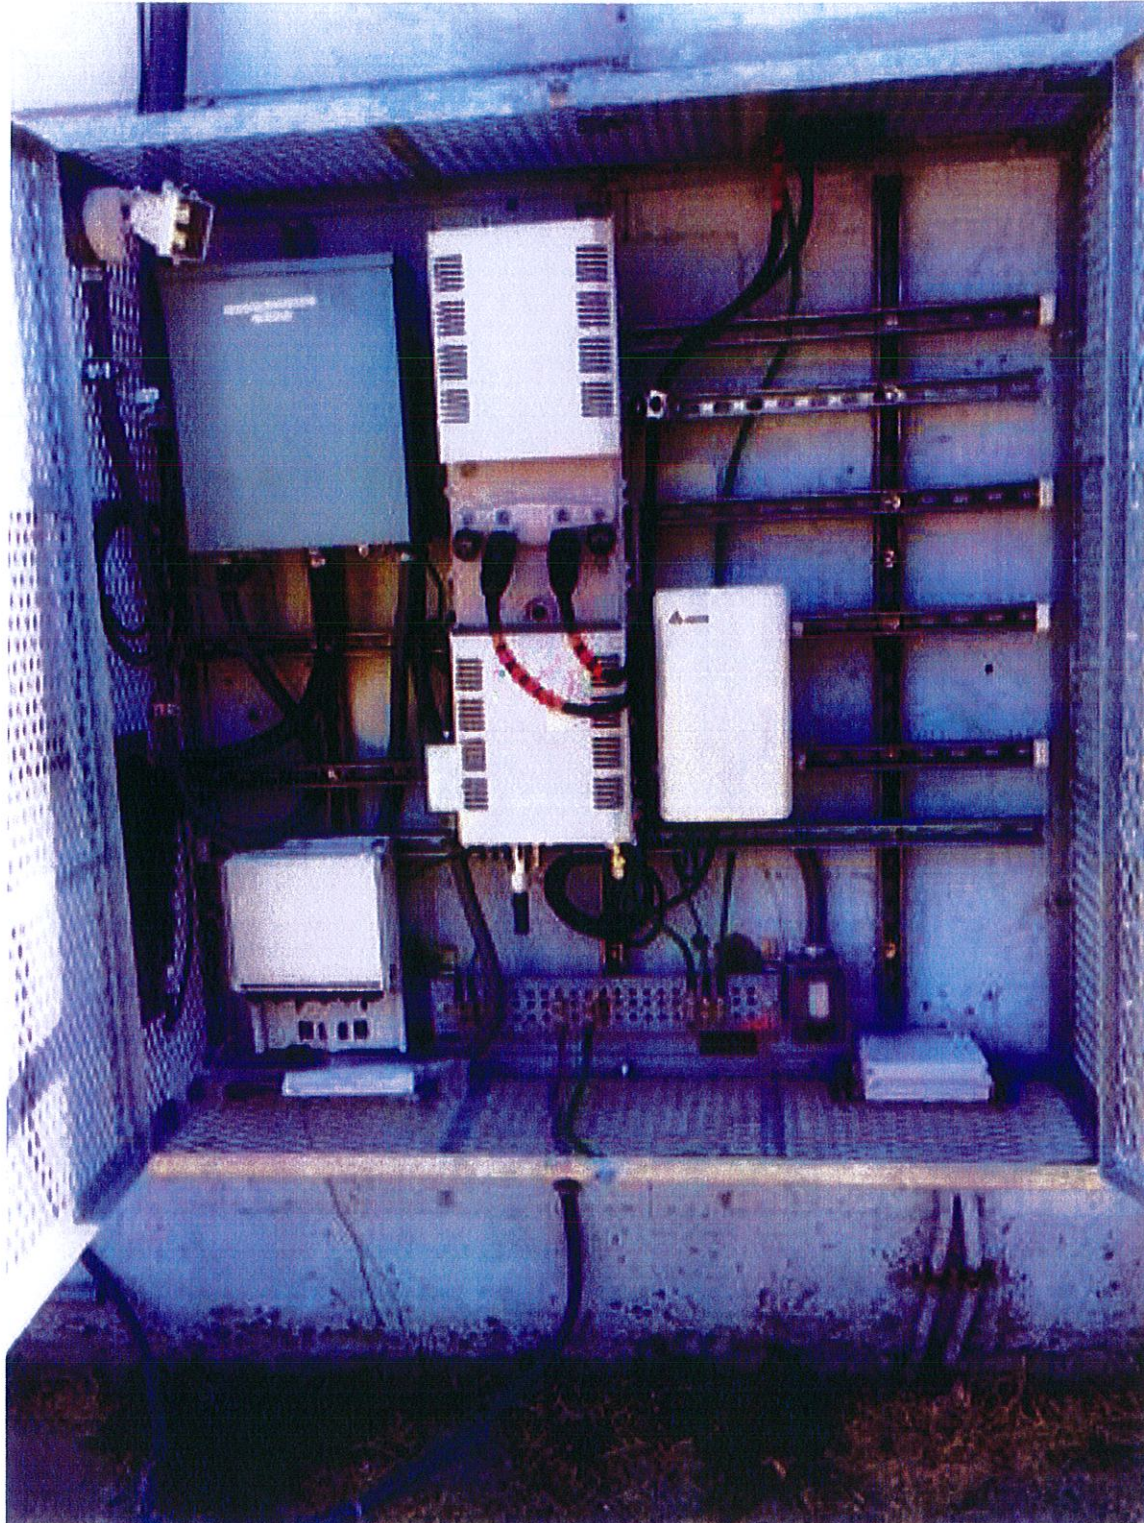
Wall-mounted Verizon small facility deployment.⁹
